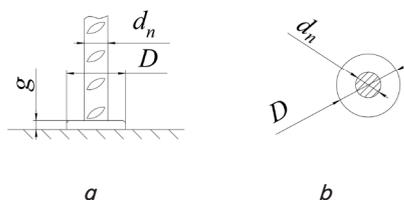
Controlled dimensions of the weld: a – side view; b – top view
